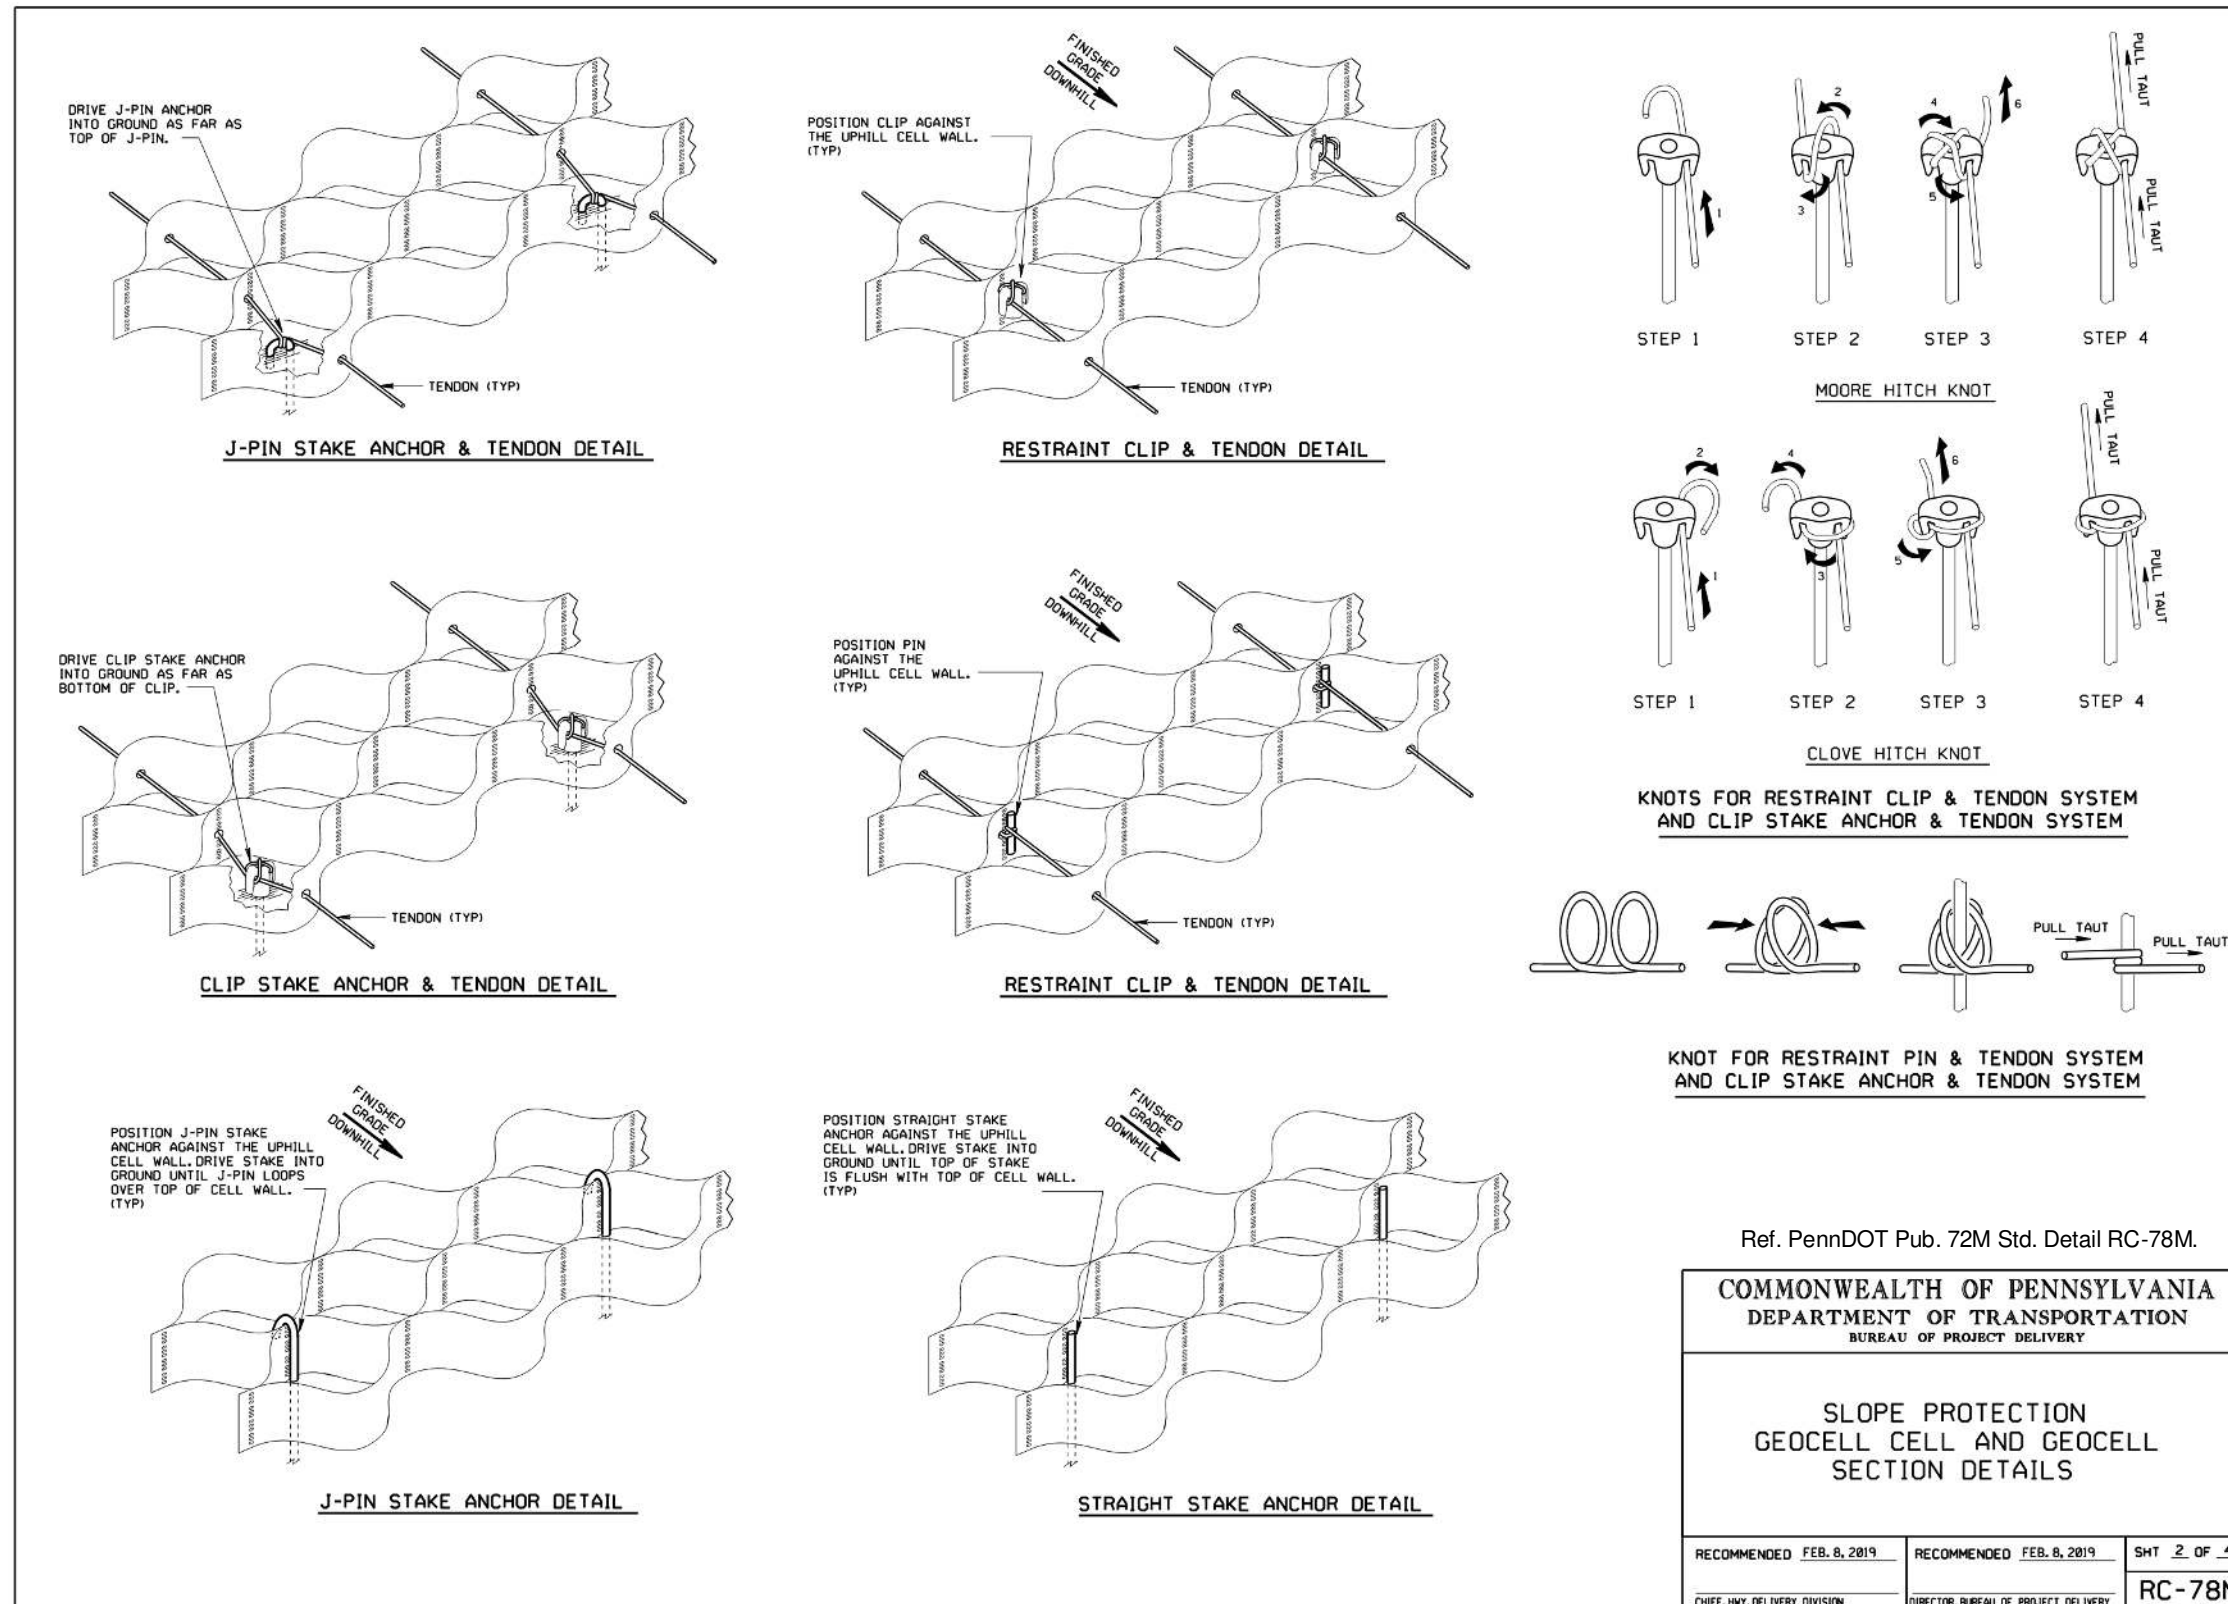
Typical Detail, Geocell (Sheet 2 of 4)
